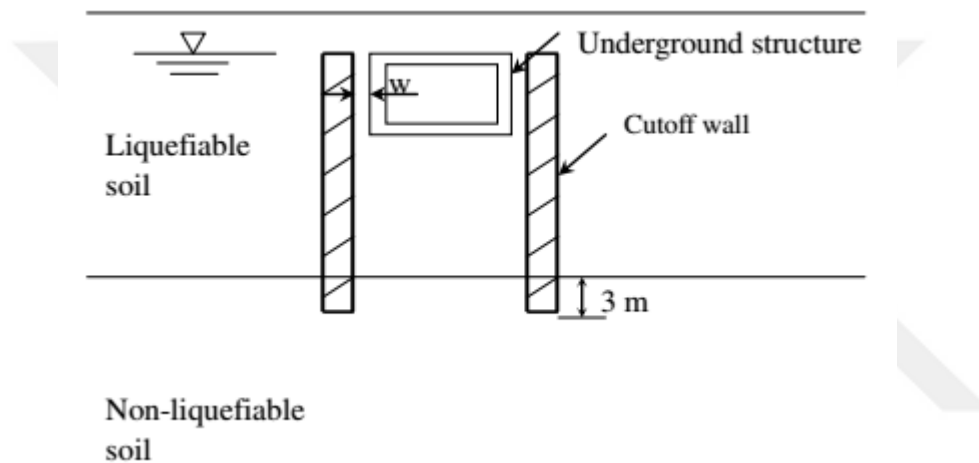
Cutoff wall installation Schematic (Liu et al,2006).
